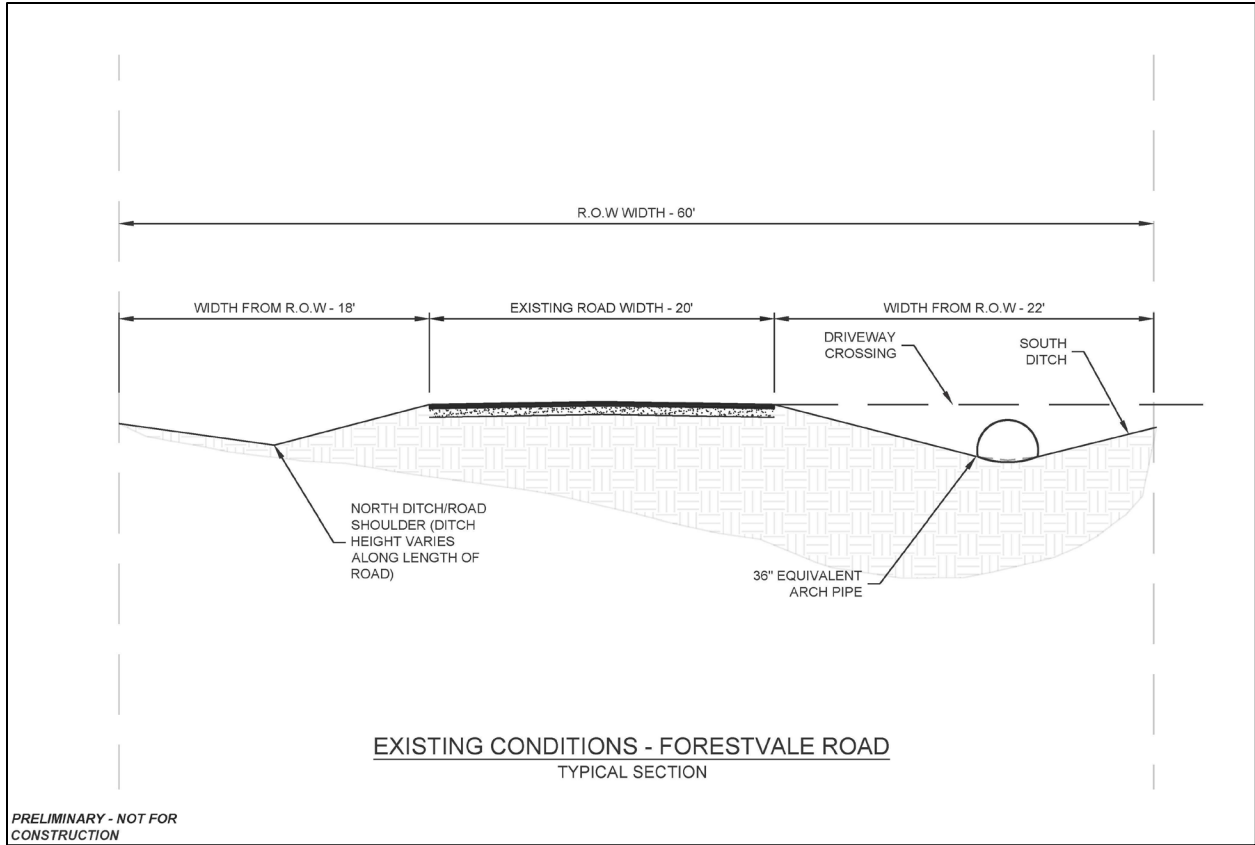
Typical section depicting the existing conditions on Forestvale Road.
